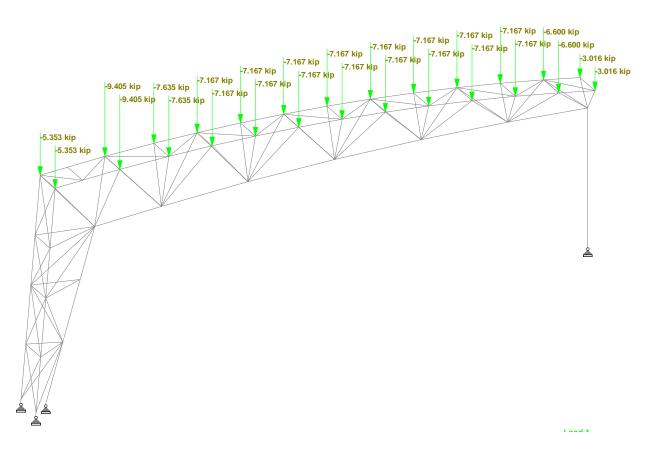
Large Truss Modeled in STADD with Loads Applied
